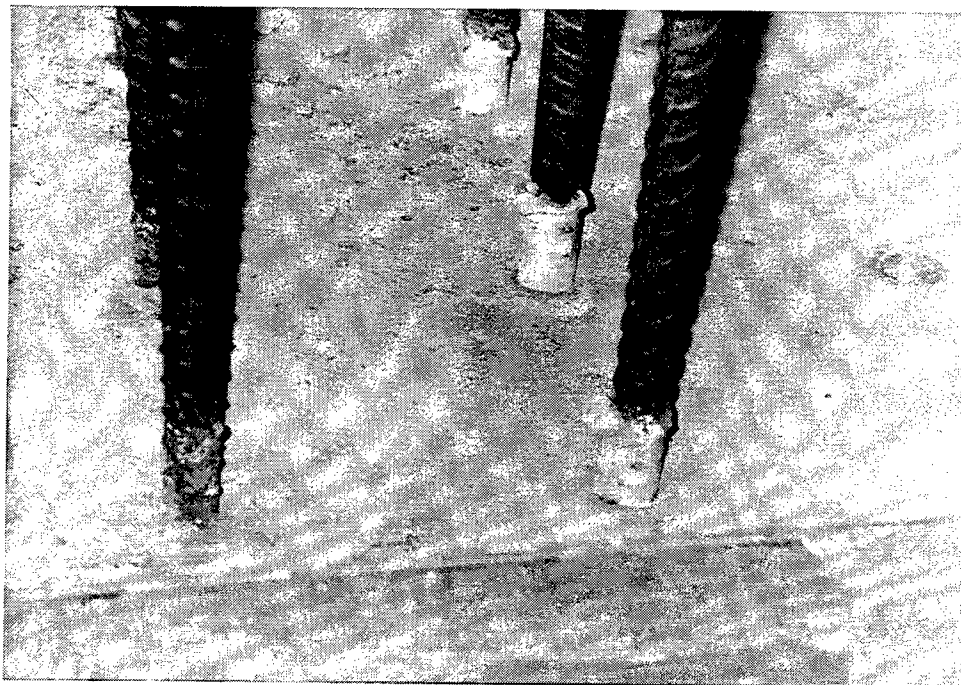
Typical failure for submerged anchors installed with Adhesives A and B
